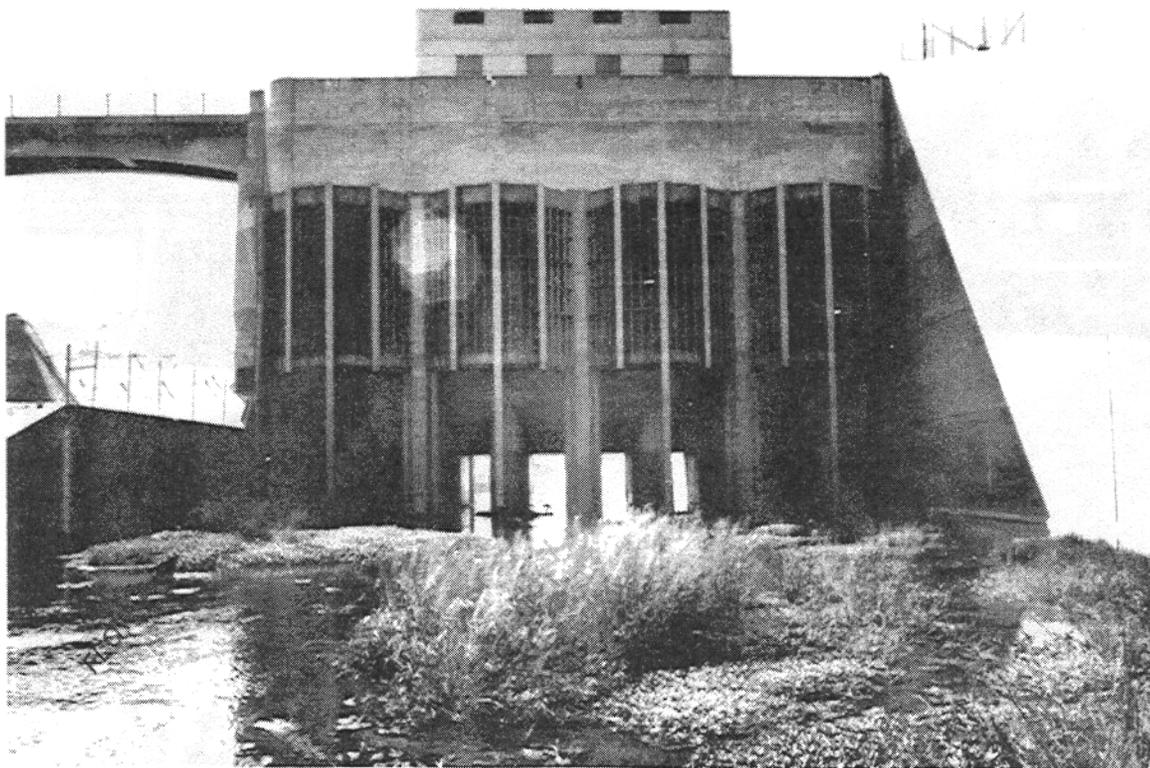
Outlet Works (gates fully open), with edge of spillway to left (view from channel upstream).
